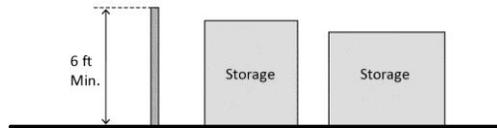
(B.3): SCREENING, OUTDOOR STORAGE AREAS
